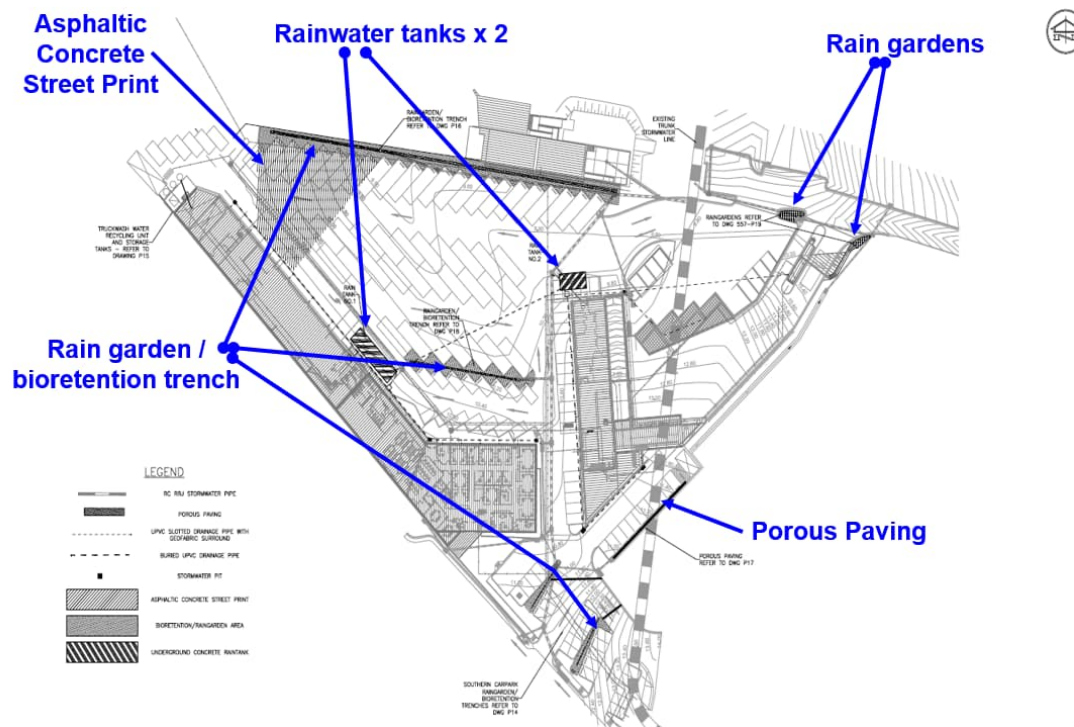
Stormwater design features of current site¹². (Source: DEVCO, 2008)
